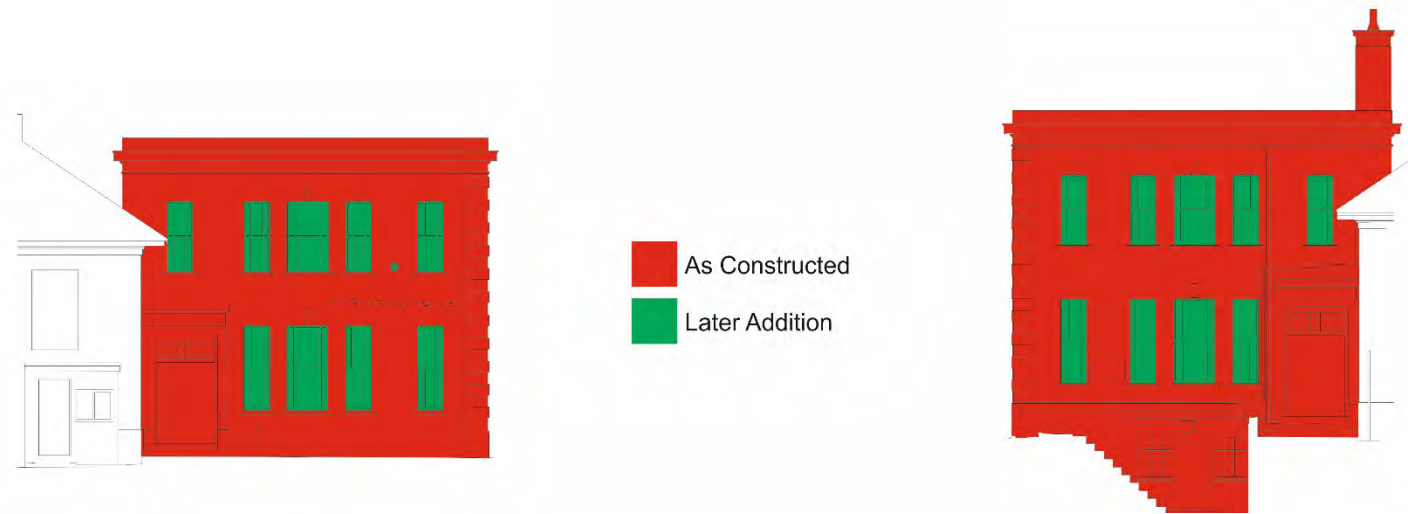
Phased southwest and northeast elevations, 1:200 @ A3
